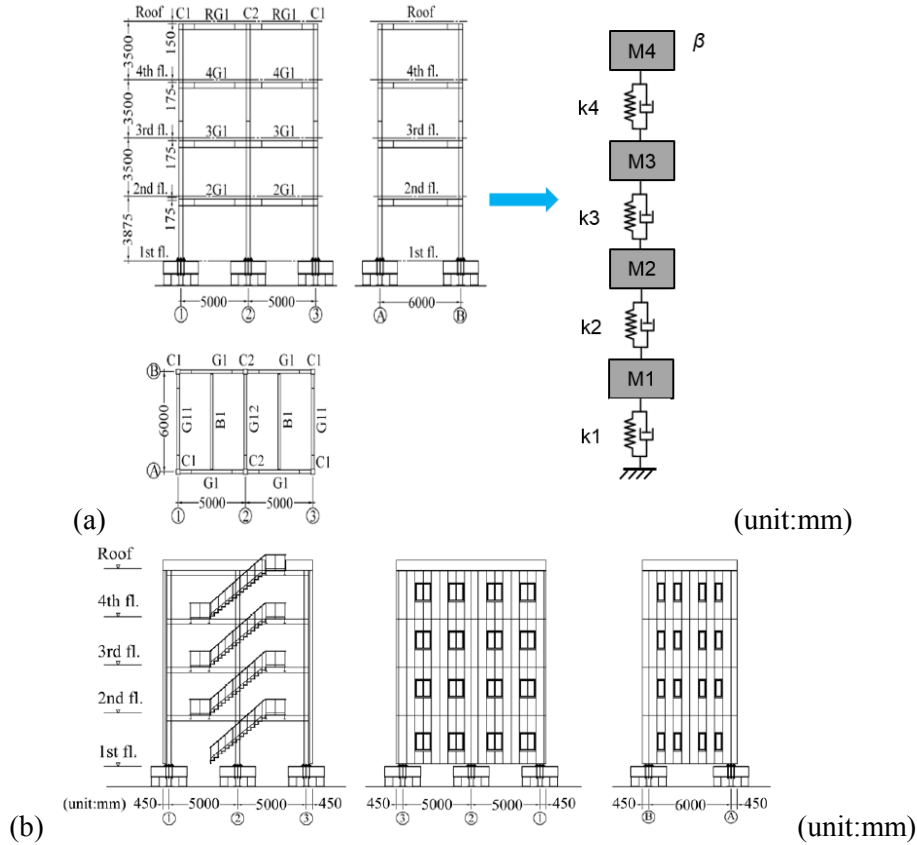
(a) frame structure of the building mode; (b) outlook of the building model
